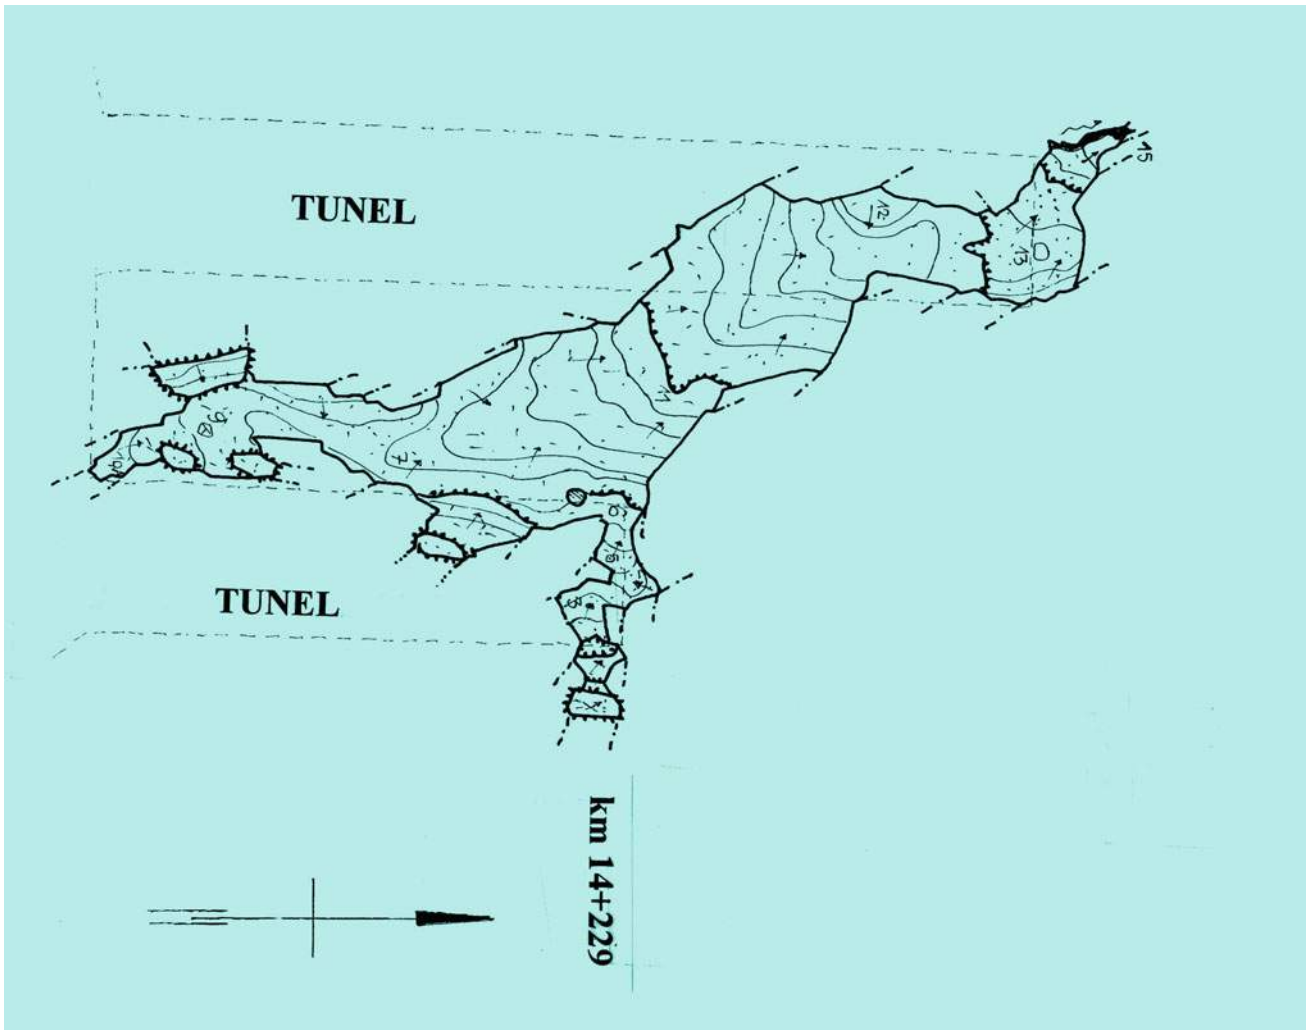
Plan of cavern at km 14 + 229 in Mala Kapela Tunnel
